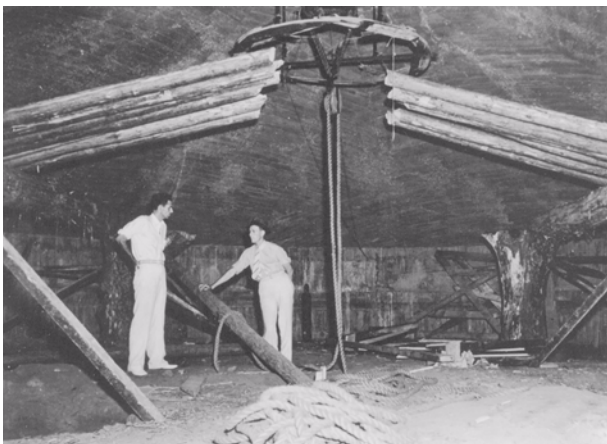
View of Earth Lodge interior with two beams and some of the rafters in place. (Swanson, OCMU Coll.)
